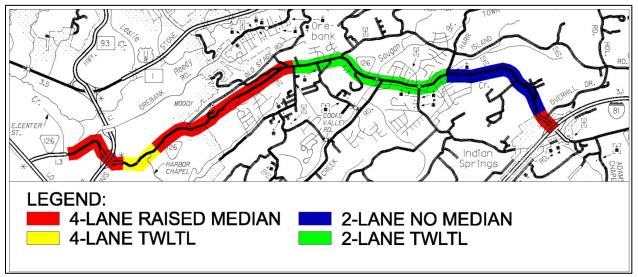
ALTERNATIVE A ROADWAY SECTIONS
